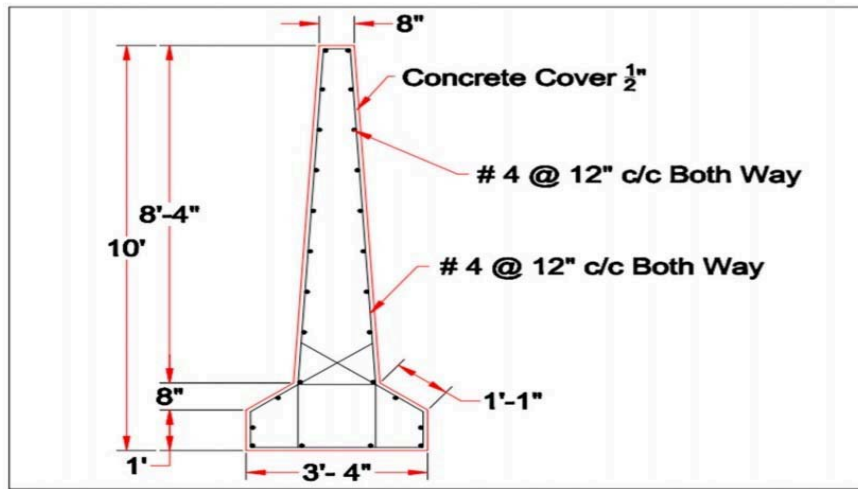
Reinforcement detail of reinforced cement concrete (RCC) wall panels
